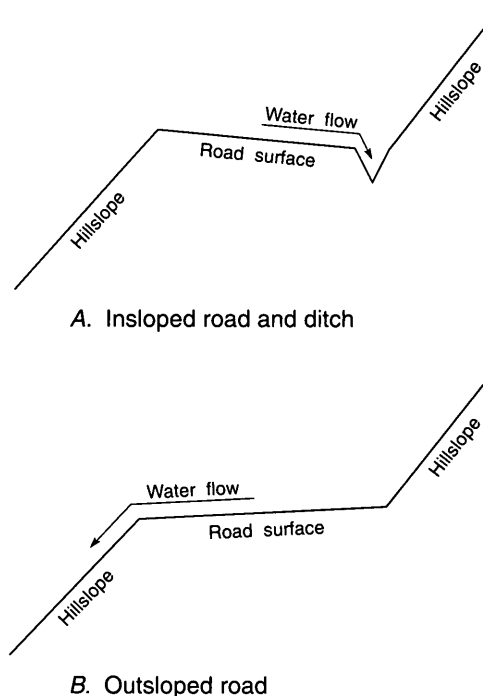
Logging road profiles showing (A) Insloped road with inboard ditch and (B) Outsloped road with no drainage ditch. Arrows show direction of flow of any water that would pond on the road surface if an adjacent culverted crossing became clogged. In A, the water is diverted down the inboard ditch; in B, the water traverses the road and flows back into the stream channel.
